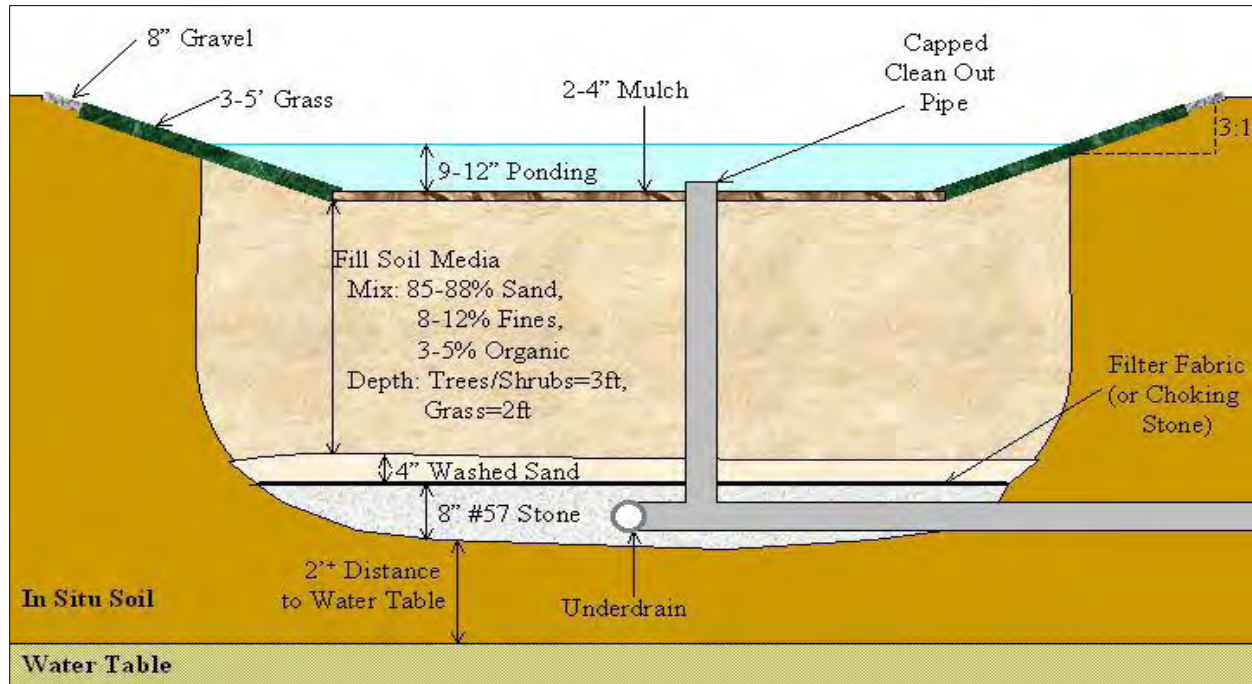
Bioretention Conceptual Layout: Cross Section (NCDWQ, 2007)
